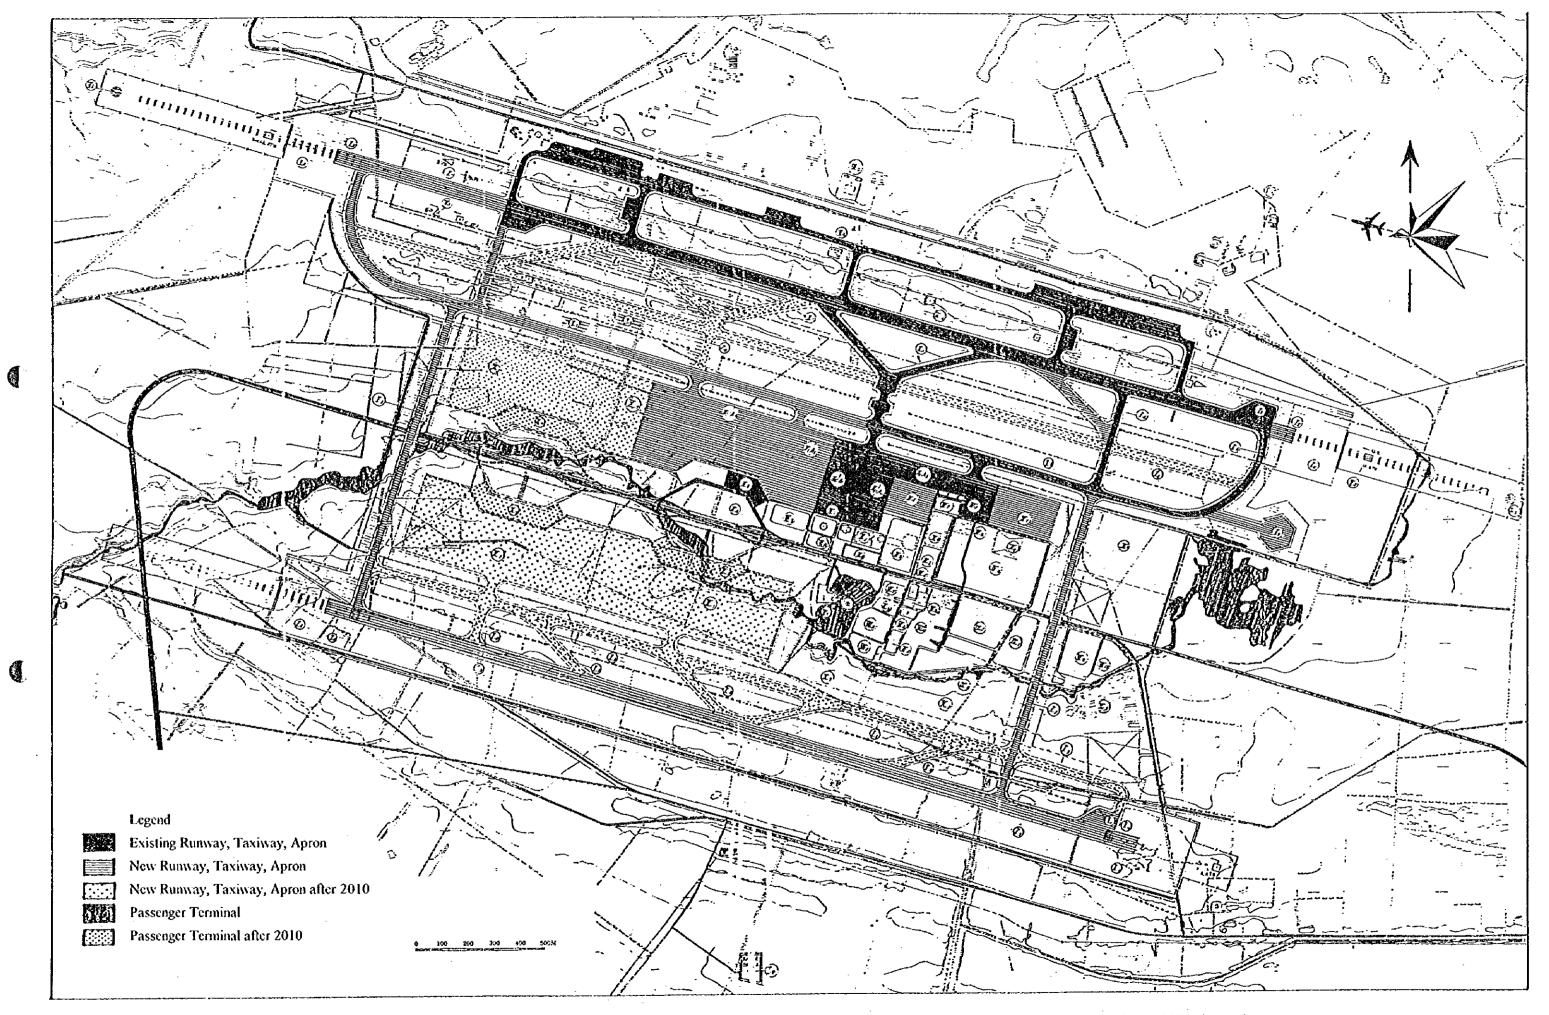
Airport Layout Plan for the Year 2010 - CAAV's Master Plan
